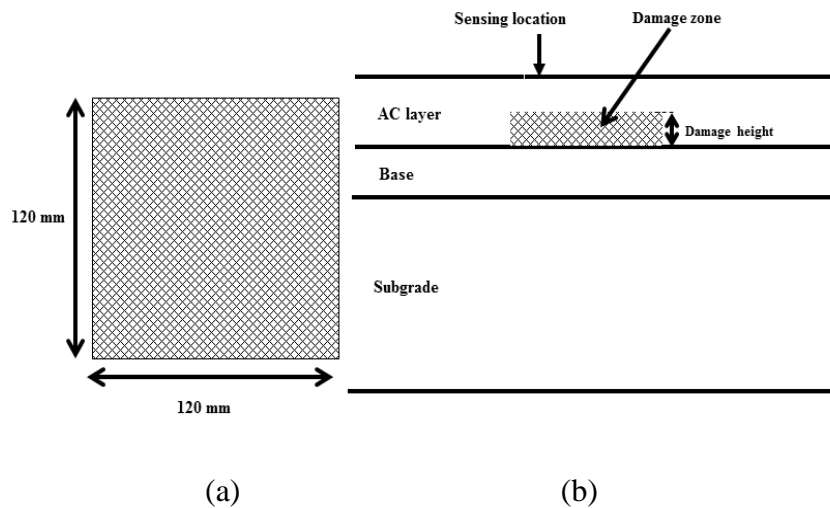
(a) Cross section of the damaged zone, (b) Damage zone and measurement location.
